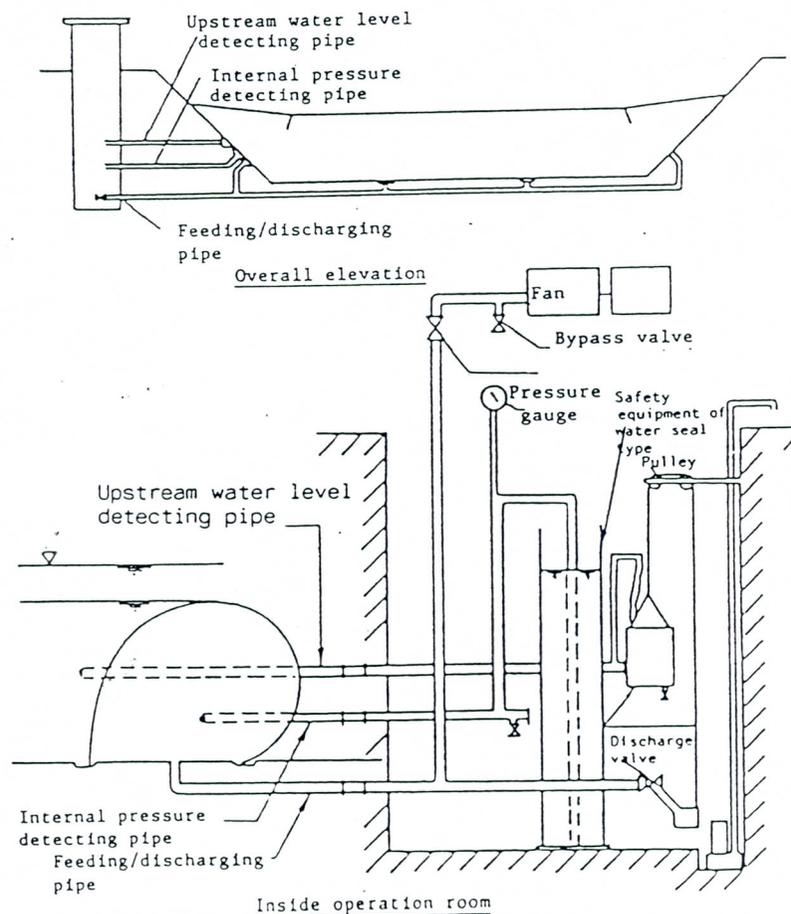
Example of installation of feeding/discharging piping (Air type - 1)
